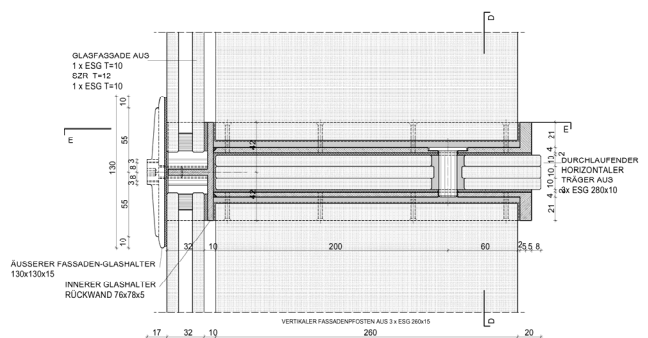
Detail connection façade column – façade girder with small stainless steel box
